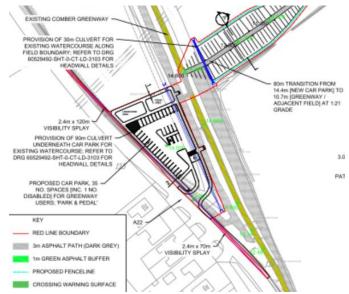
Proposed initial section of the greenway including the car park on Belfast Road (Drawing 28C).
